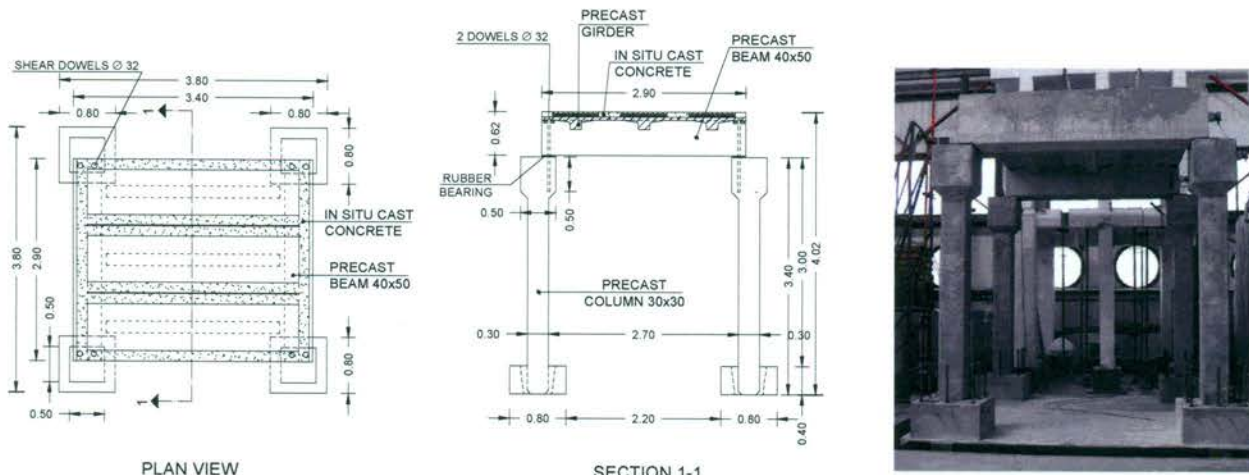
Top view, vertical cross section and photo of the specimen used in the 4th series of experiments.
